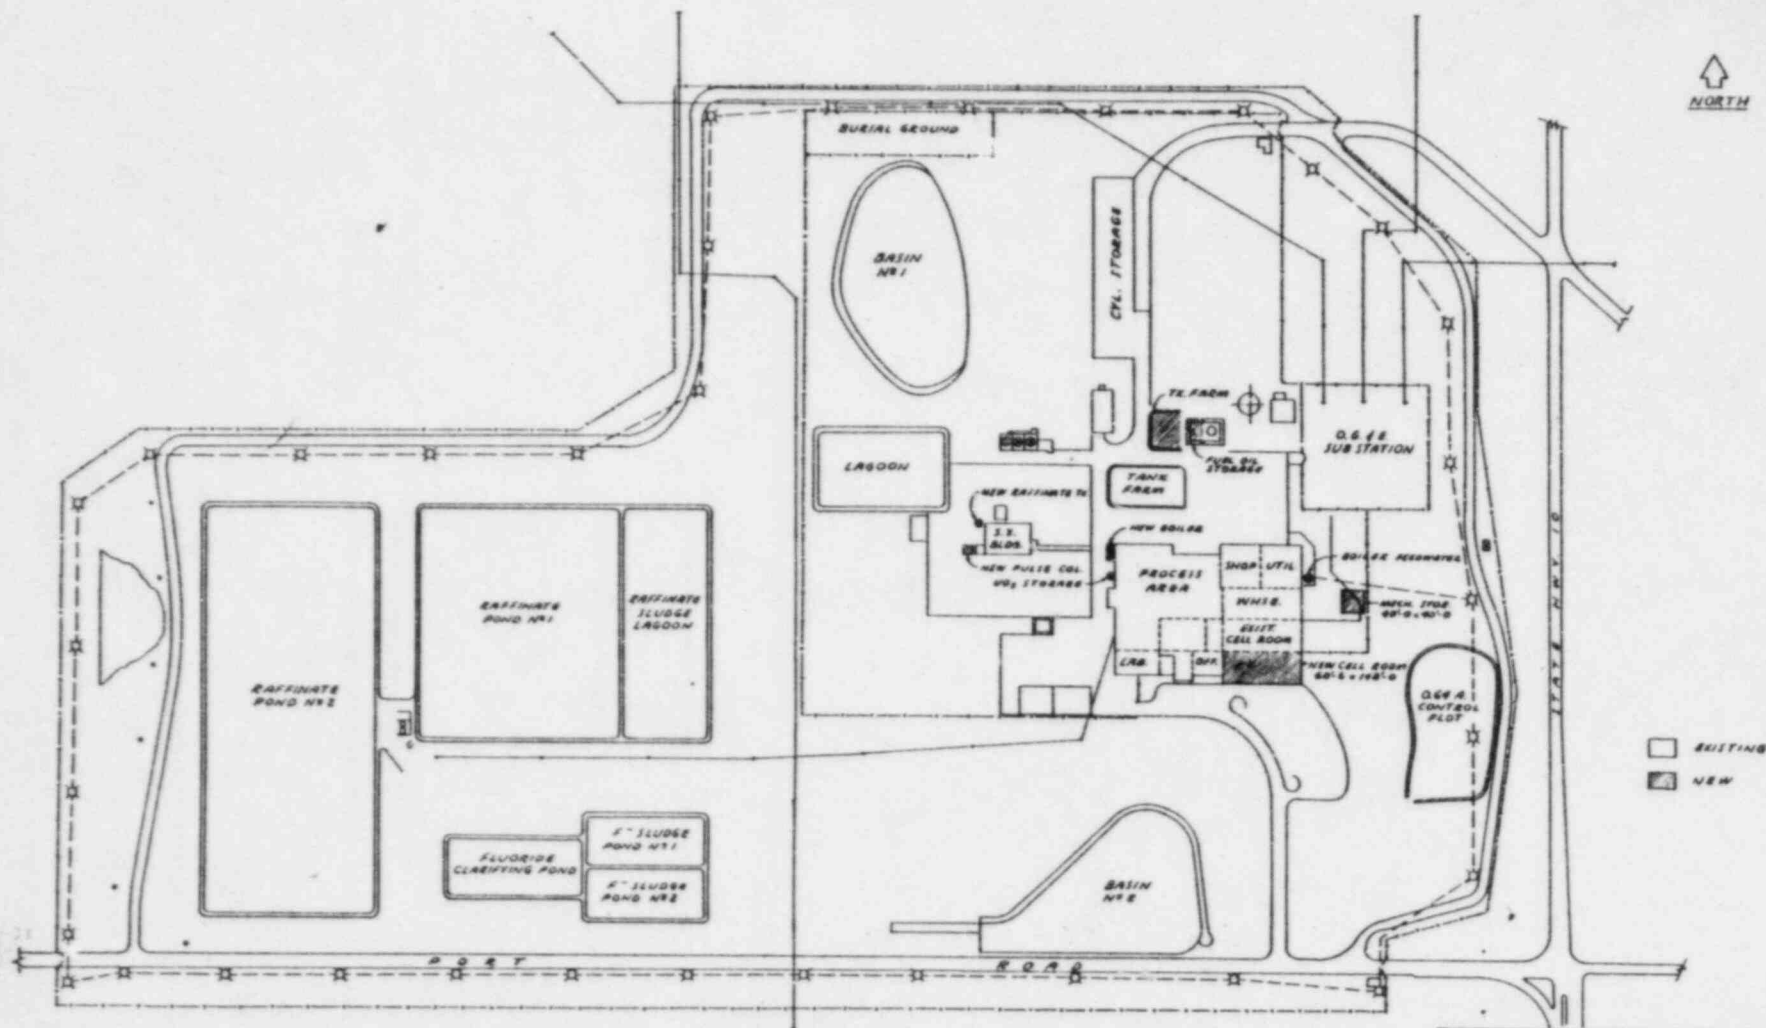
PLOT PLAN AFTER EXPANSION
